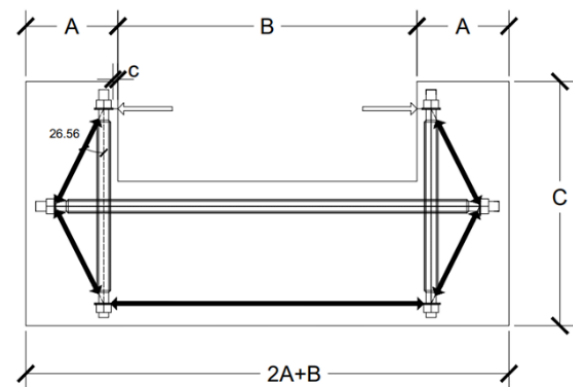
Typical specimen geometry showing bars with PVC tube to avoid bond
